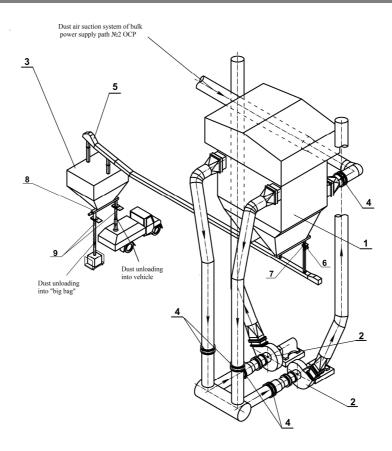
The scheme of centralized aspiration gas purification B2: 1 – bag hoseFRIR-1100×2; 2 – exhauster DN-19MK; 3 – dust collecting hopper; 4 – valve Du1500; 5 – conveyor COW (2 M)-320; 6 – gateway feeder; 7 – disc valve; 8 – reversing screw feeder; 9 – plate gate
